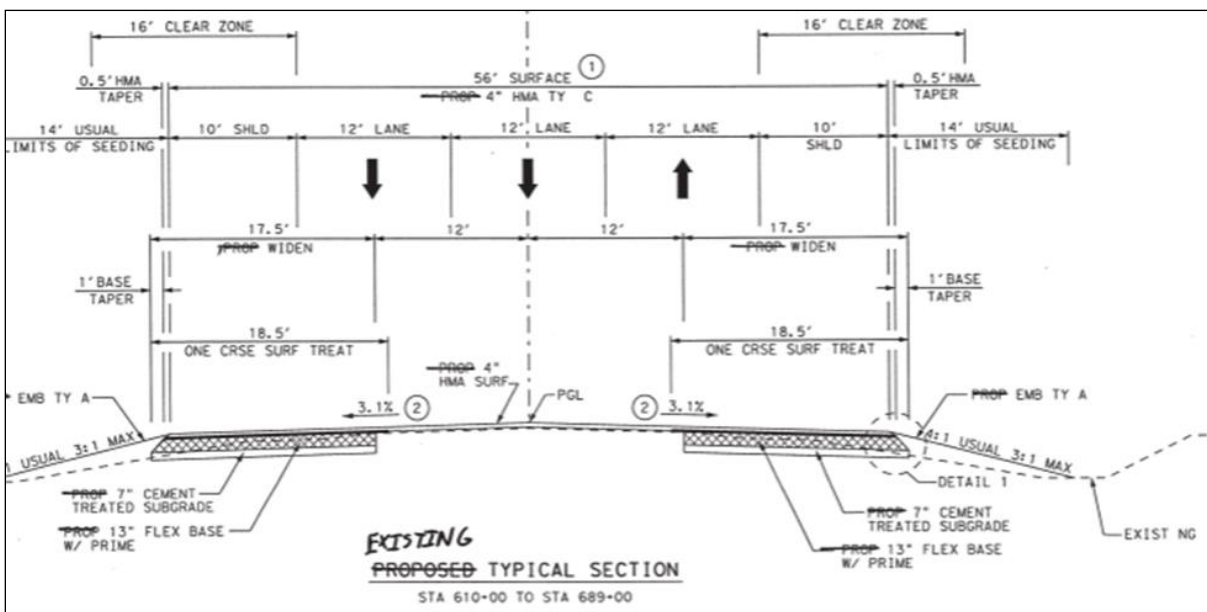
Post-Construction Typical Section Example 2, Project 1.
